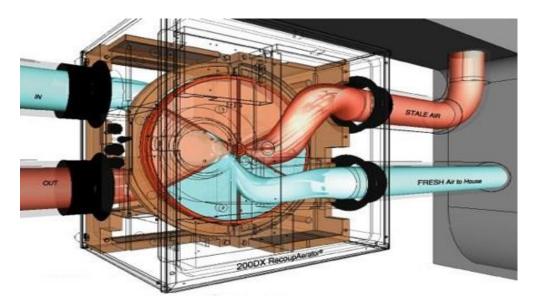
Shows a three dimensional view of the Heat Recovery Wheel and the placing of Fresh and Return air duct.
